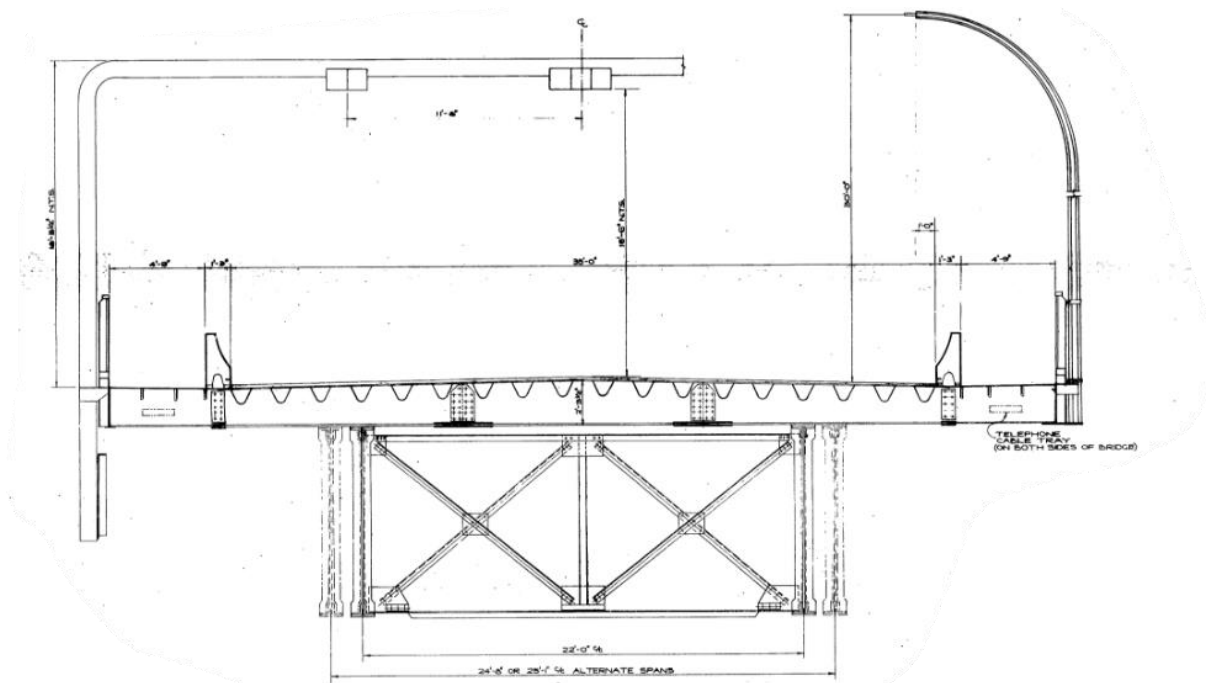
Typical Cross-Section of Lions Gate Bridge North Approach Viaduct
